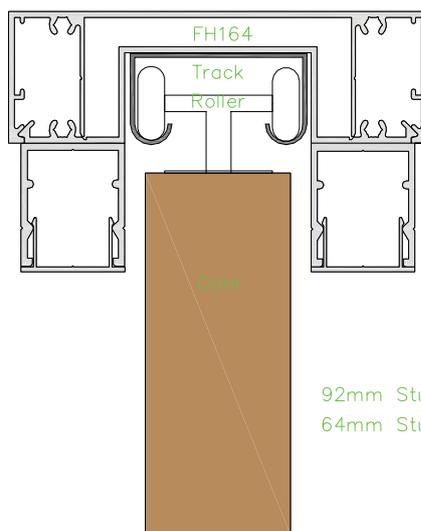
| Metinno Aluminium Assembly Detail for 64mm or 92mm Studs
